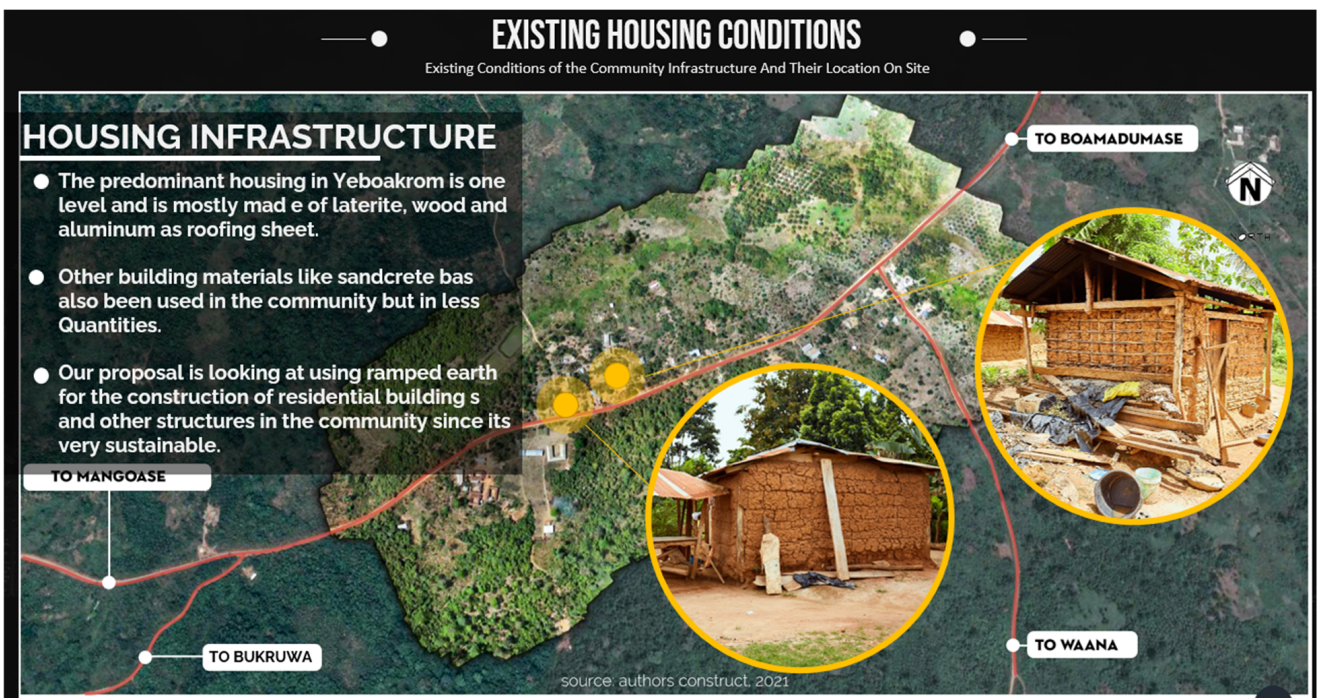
Existing housing conditions of Yeboahkrom (Source: Authors Construct, 2021).
